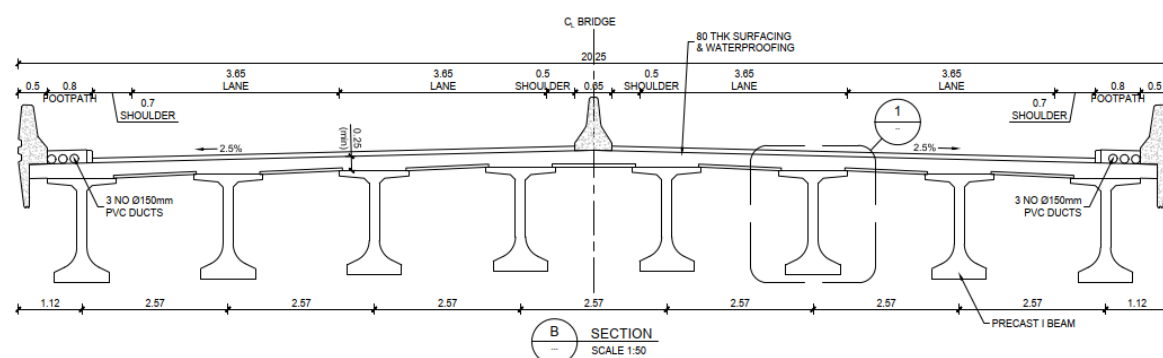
Typical cross section (Precast I-beams) for Bhola-Lakshmipur access spans.
